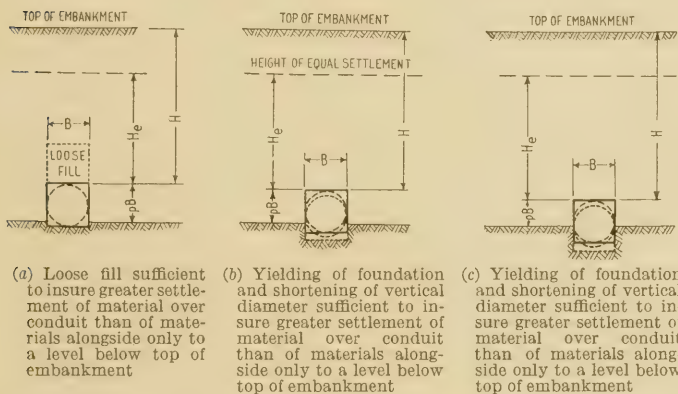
TYPICAL EXAMPLES OF IMPERFECT DITCH CONDITION OF LOADS ON CONDUITS FROM TRENCH FILLS AND EMBANKMENT MATERIALS
